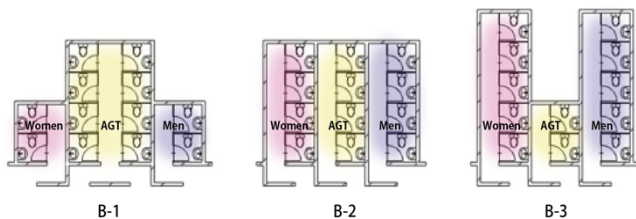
Plan type B-1, B-2, B-3 (Number of toilet rooms)
